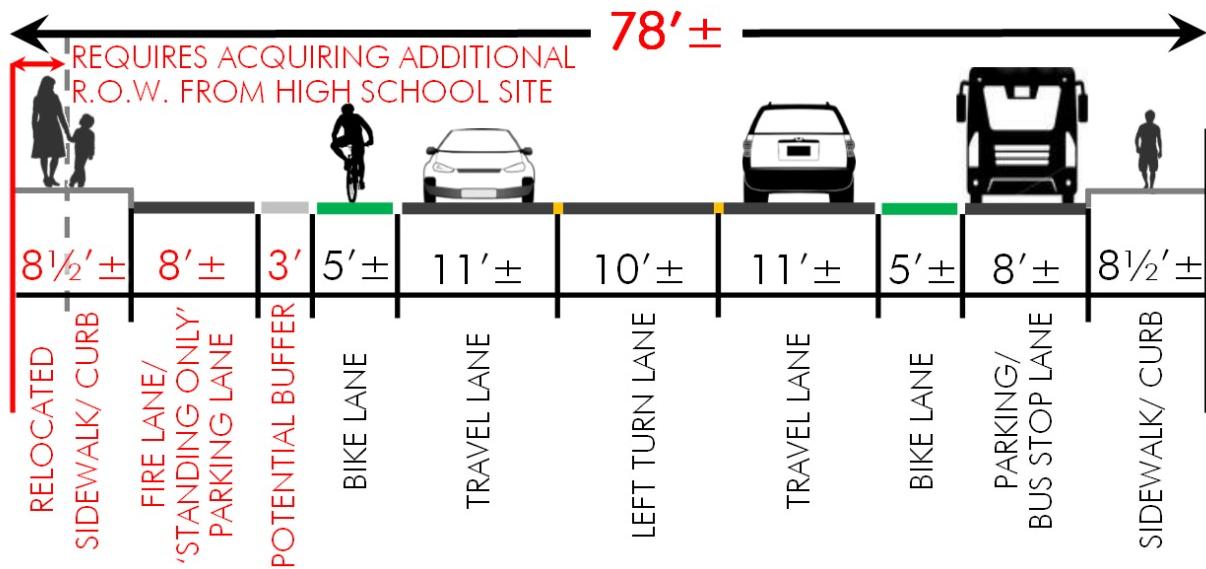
Sketch of Potential Design Option for Massachusetts Avenue at Site
